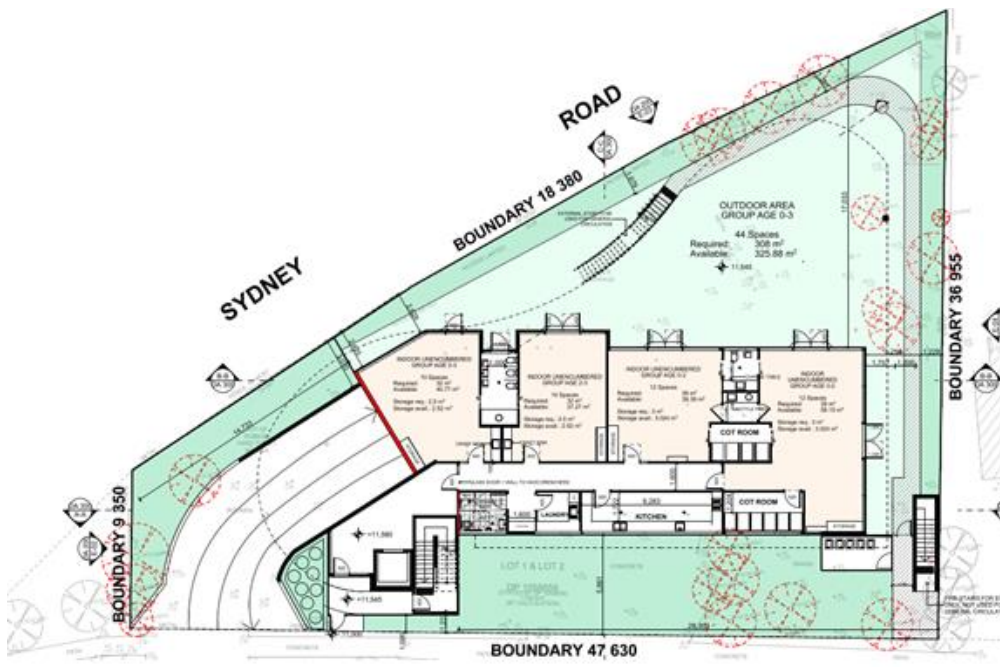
Ground floor plan (outdoor children play area for aged group 0-3 is fully undercover)
